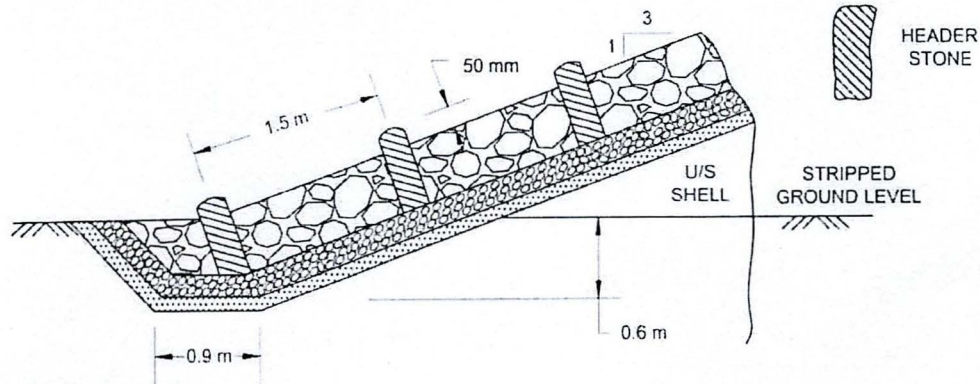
PITCHING AT STRIPPED GROUND LEVEL
